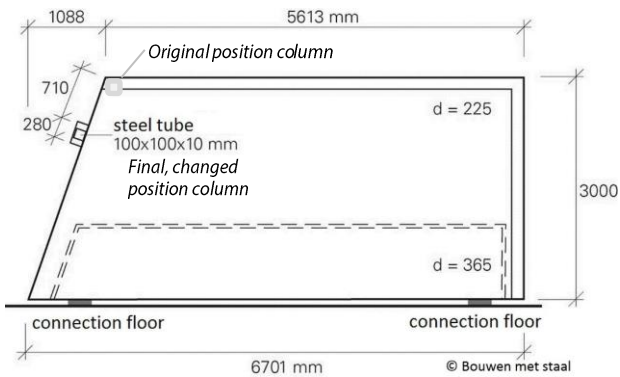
Top view of standard balcony with original and final position of column (adapted from [11,12] with permission). Mind that balcony slab level 1-5 is thicker than slab on ground level (figure 2).
